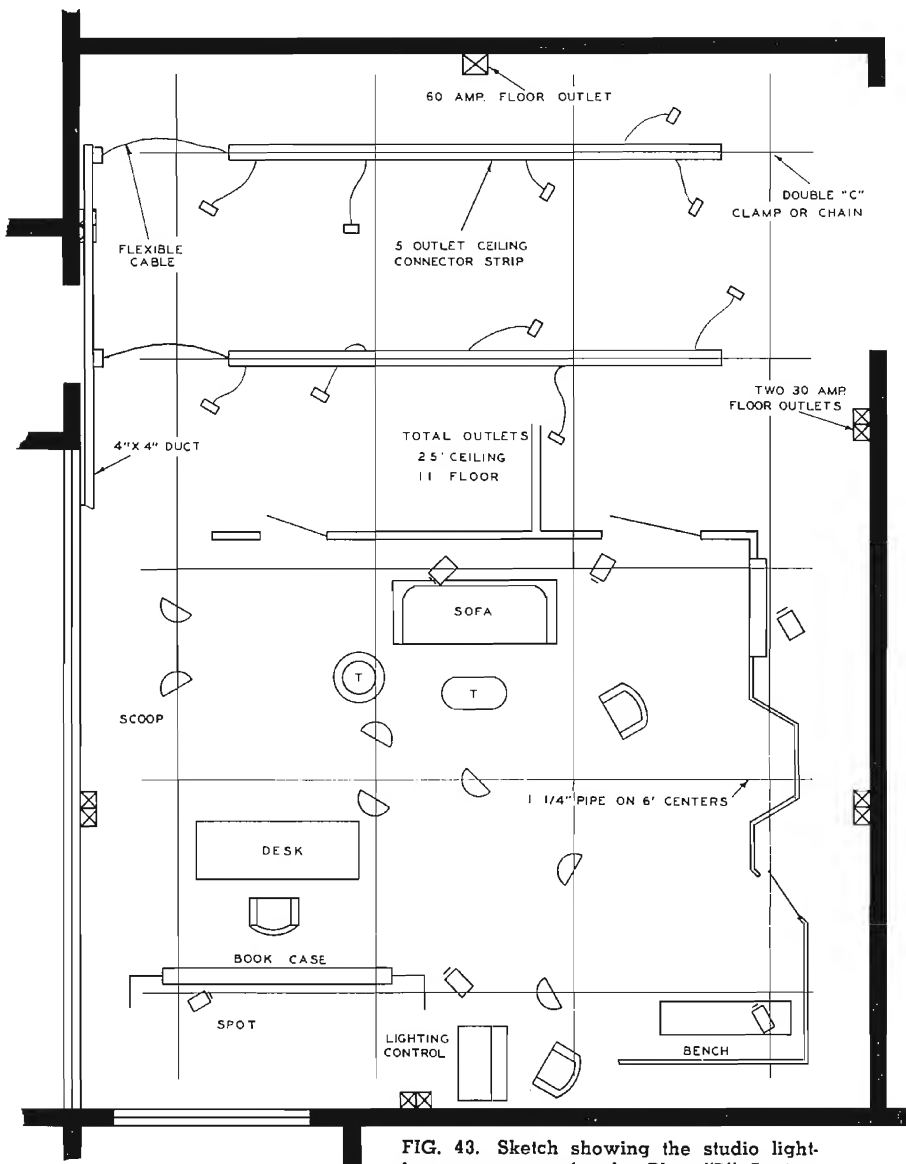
Sketch showing the studio lighting arrangement for the Plan "B" Station.
